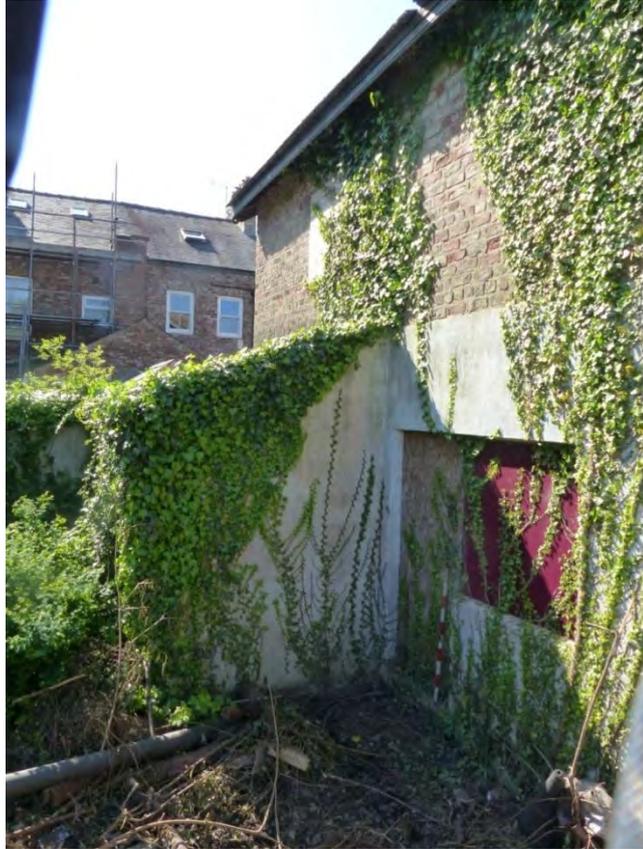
Rear (east) elevation of eastern coachman's cottage, looking south-west
